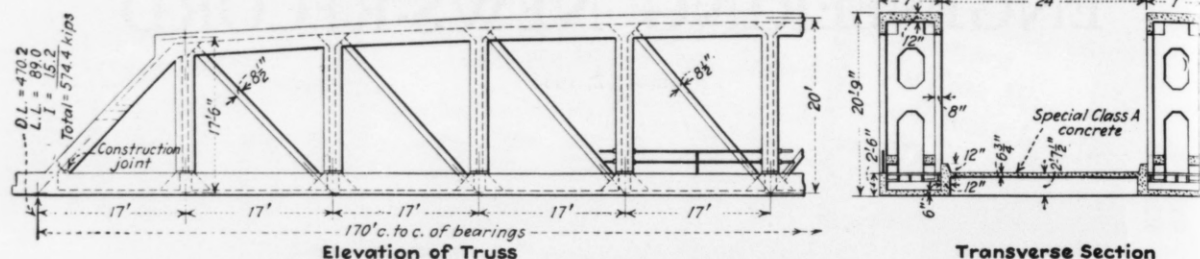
ELEVATION and cross-section of through concrete truss span, the longest in the United States. Design provides for eliminating lateral bracing of trusses above the roadway.
